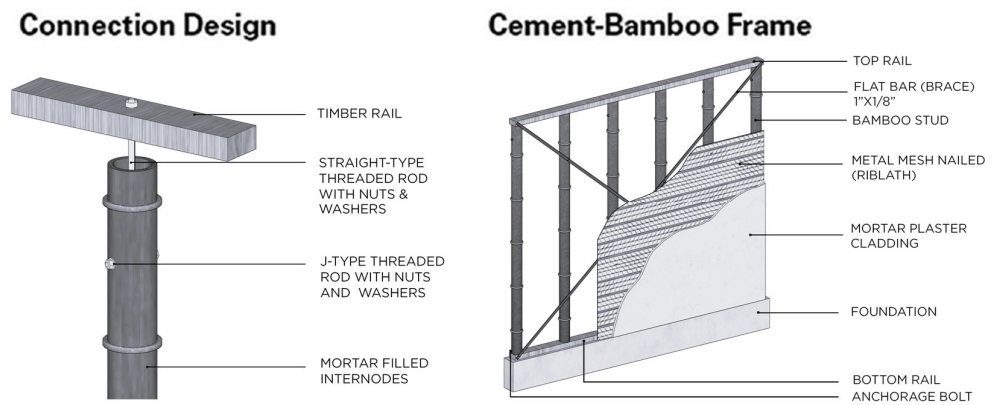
Connection design and wall structure of a cement bamboo frame building as proposed by BASE [15].
